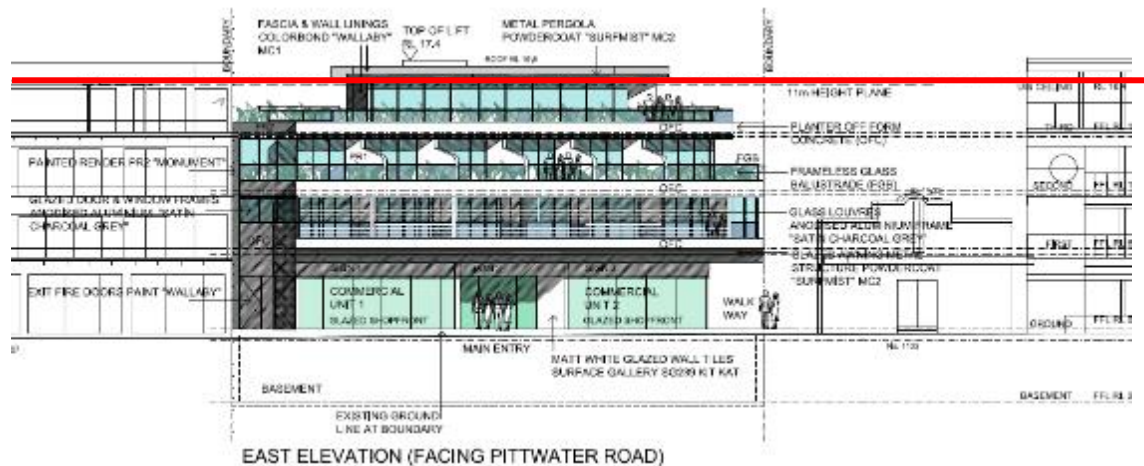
Plan (east elevation) extract showing extent of 11 metre building height breach
